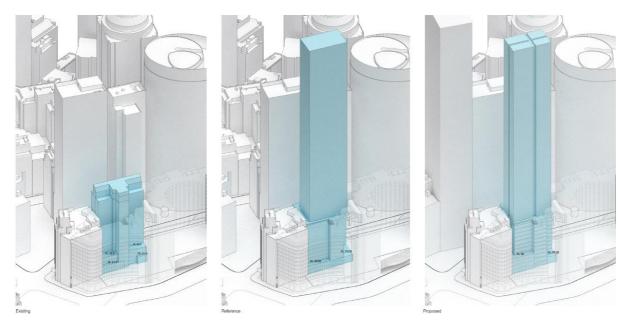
| Axonometric drawing showing proposed massing to the rear (Source: Woods Bagot)
